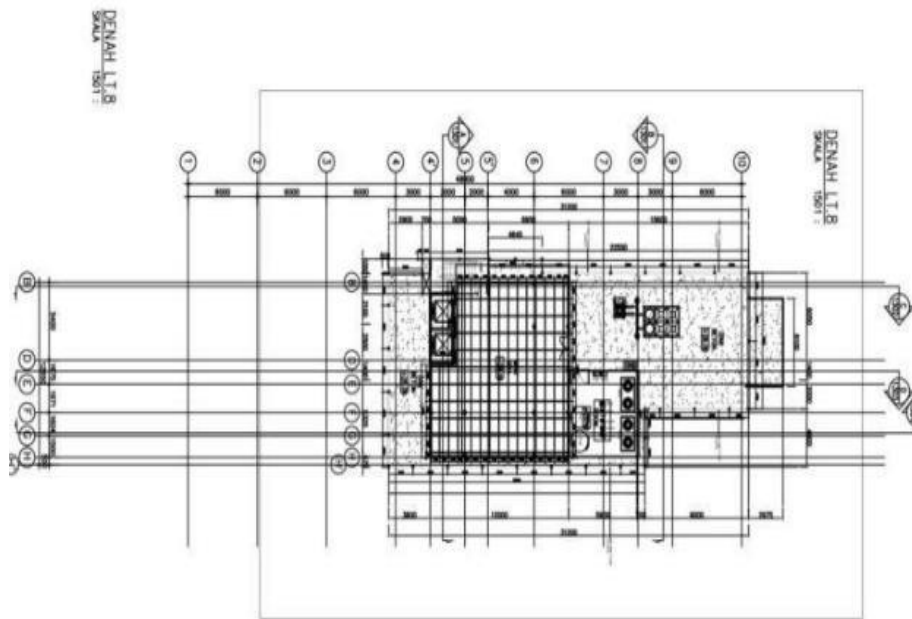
The 8th floor plumbing roof top installation system at Max One Hotel Kramat Jakarta
